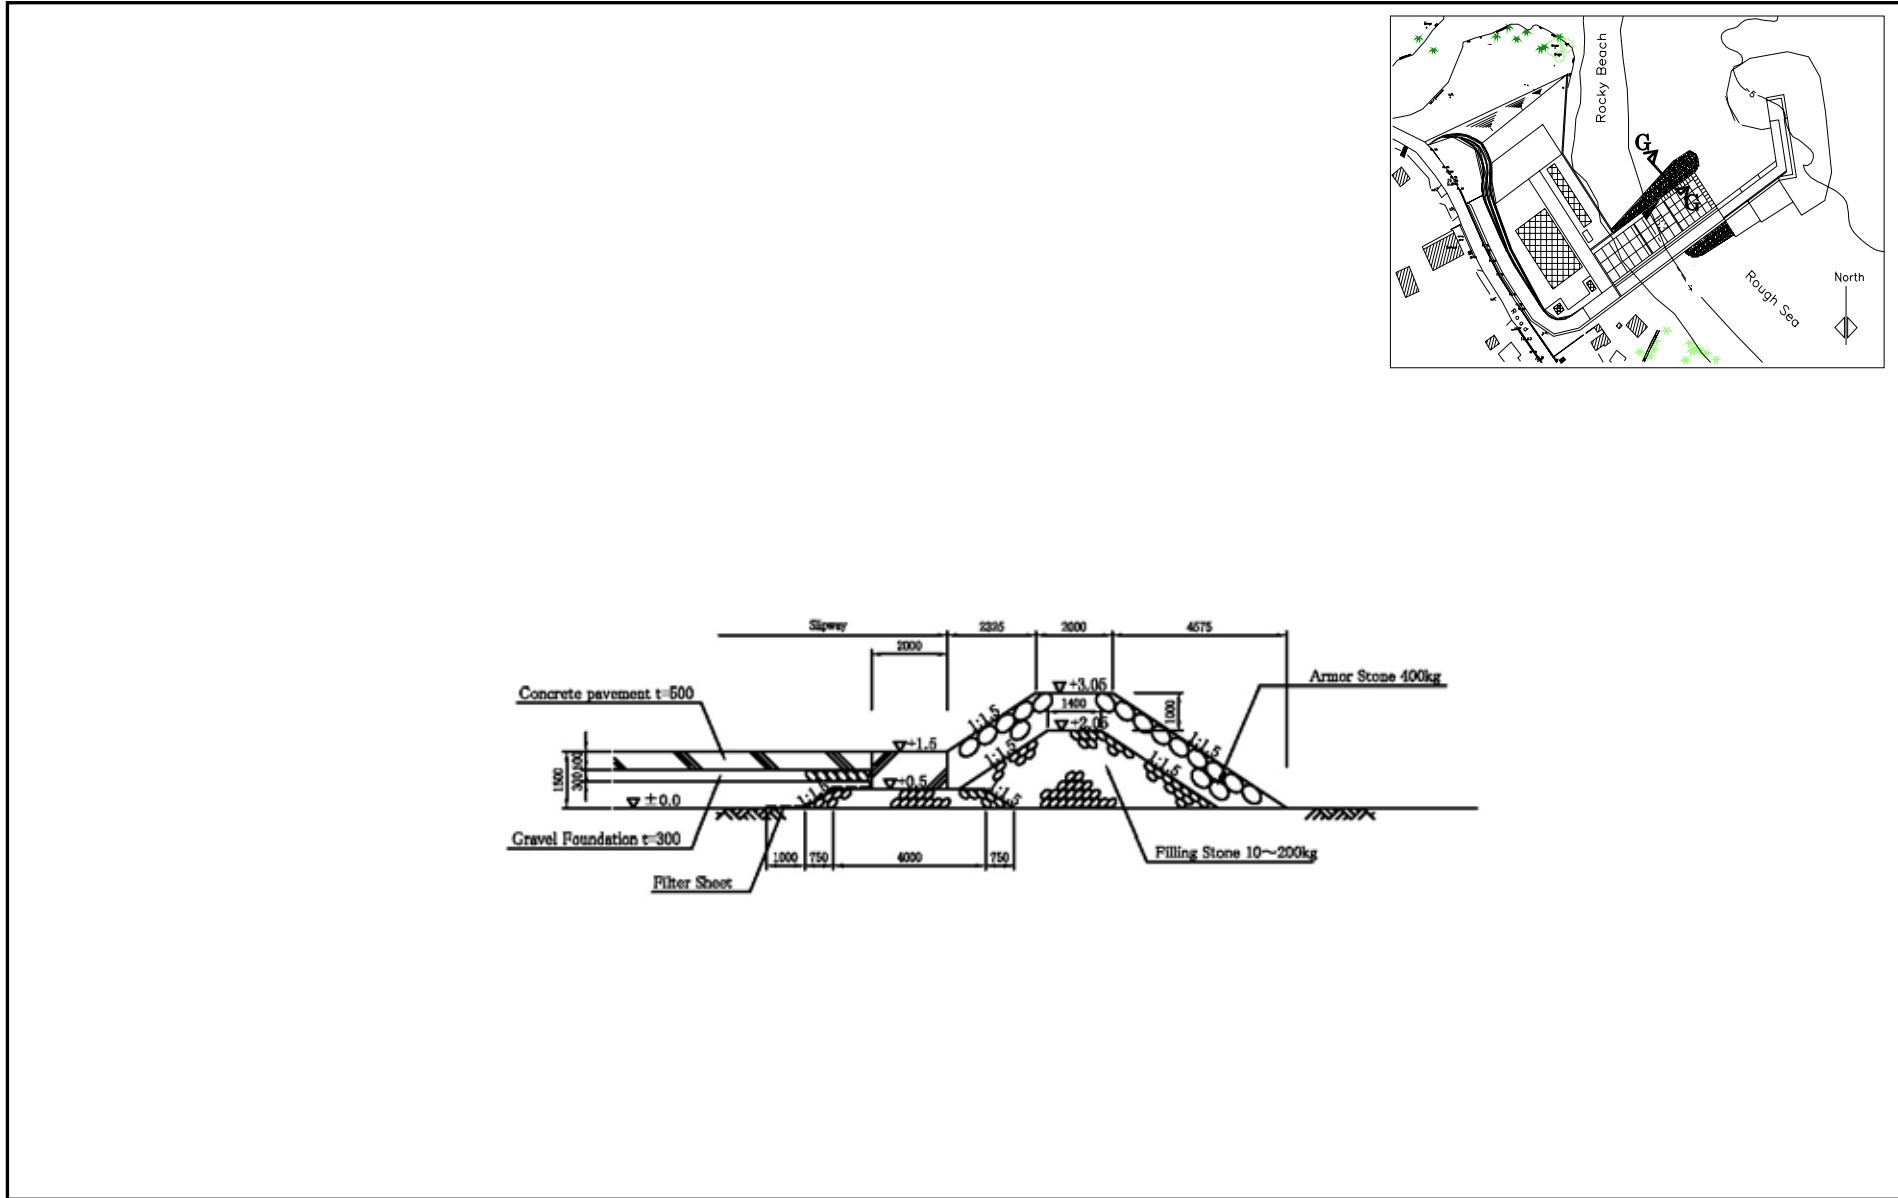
(8) Cross Section for Rubble Rock Mound Revetment (Section G-G)
